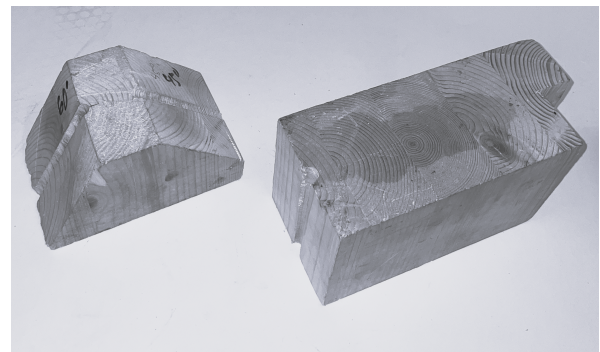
Guide for proper placement and inclination of pre-drilling.
